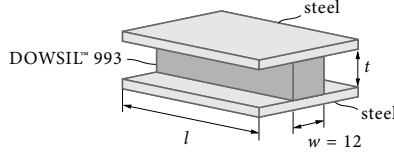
H-shaped specimen of length l and adhesive thickness t . Dimensions in mm.
